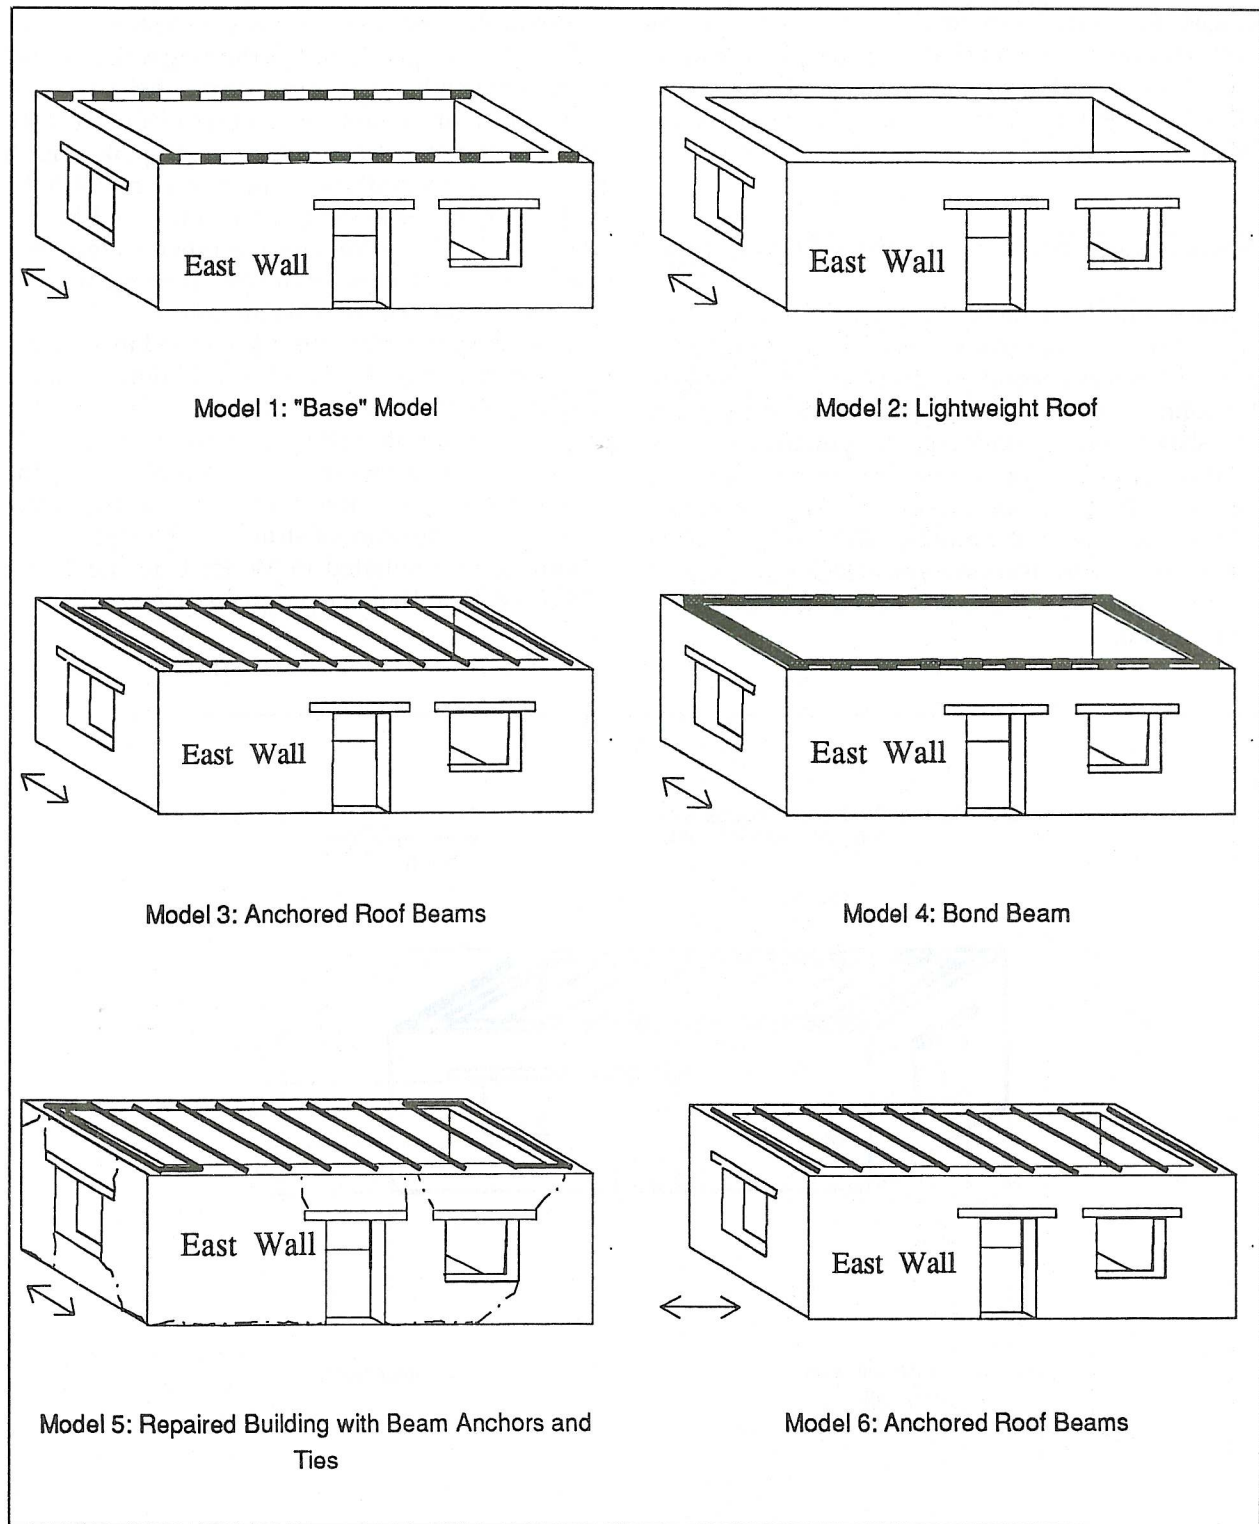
Schematic drawing of six 1:5 scale model buildings (arrows indicate direction of table motion).
